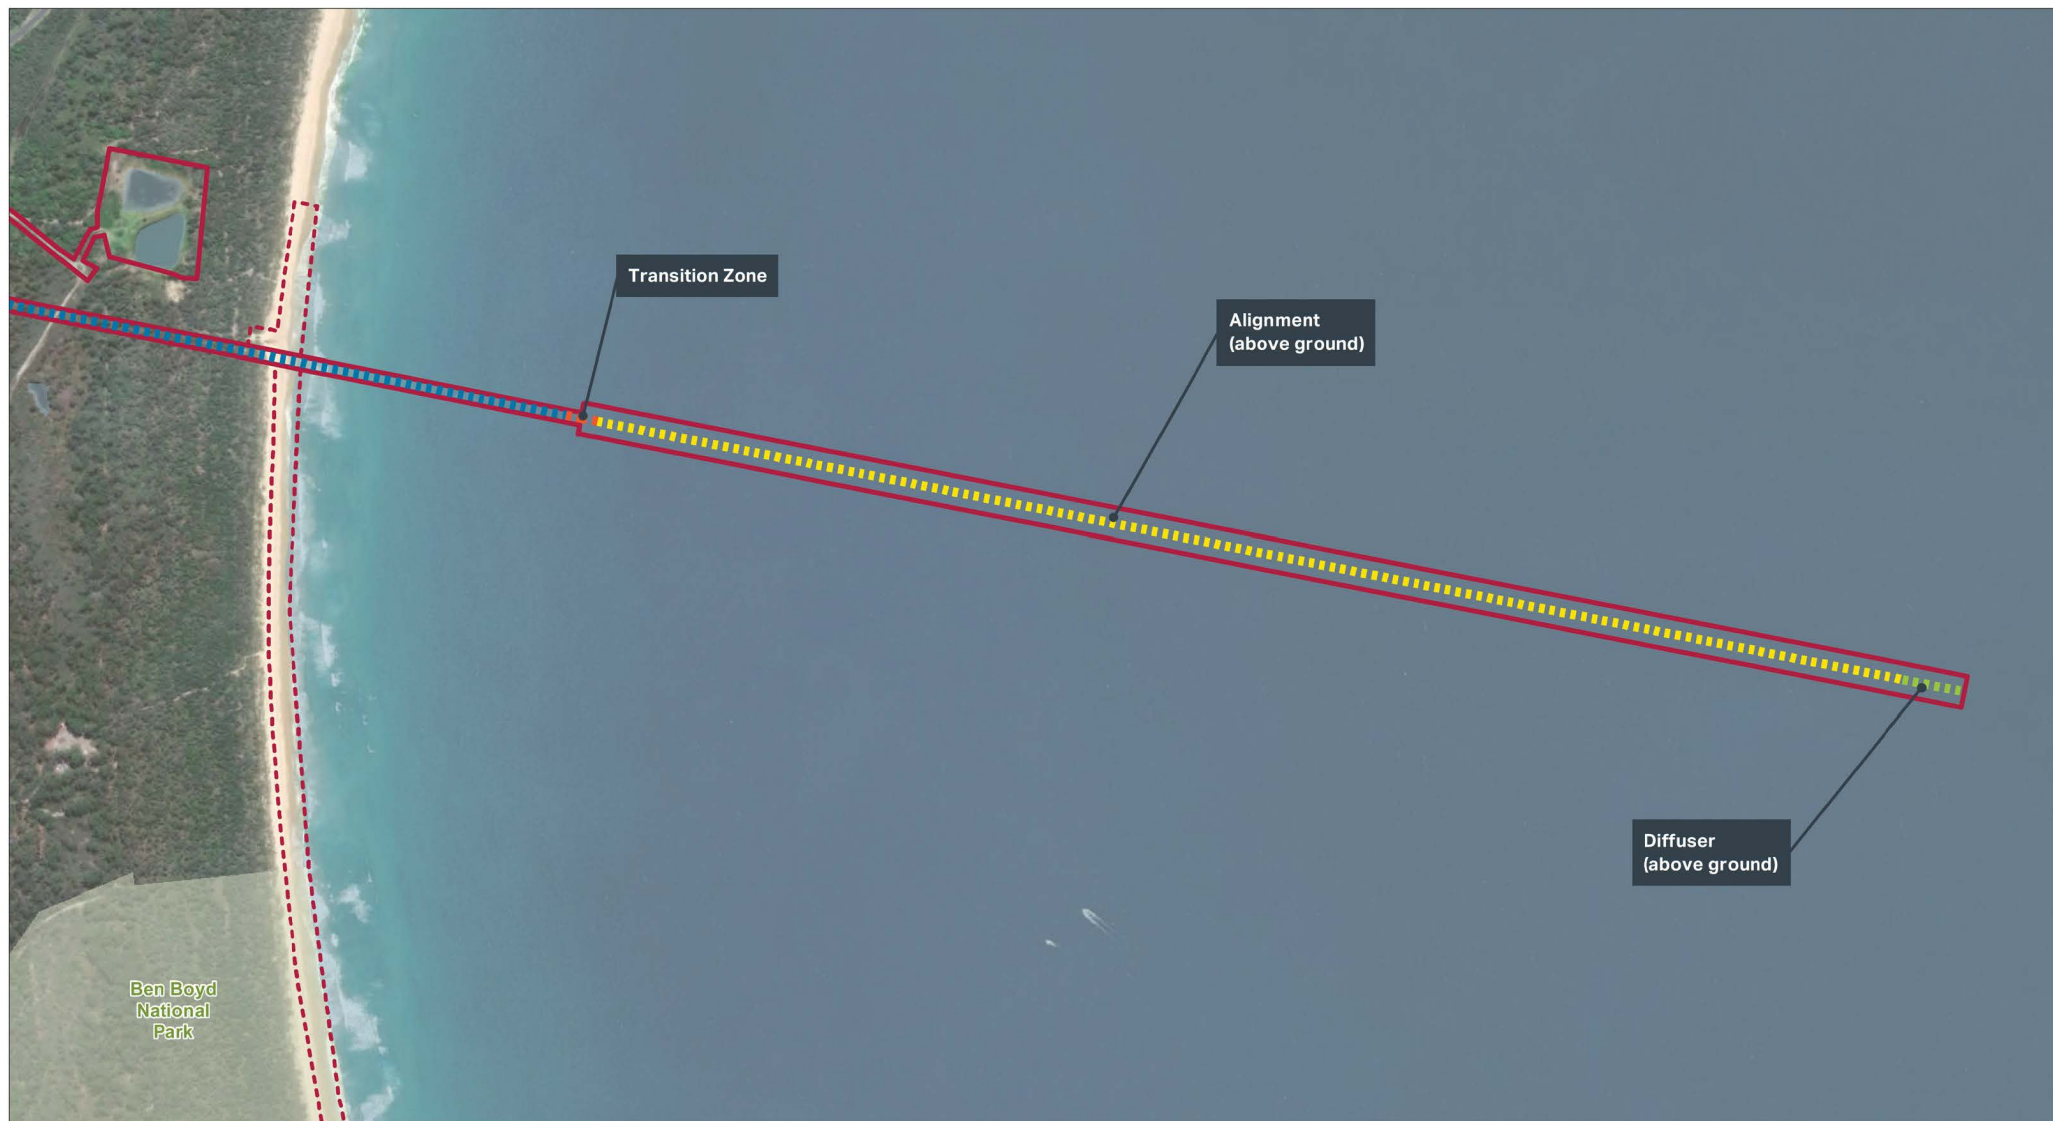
OCEAN OUTFALL PIPELINE – SECTION 2 (ABOVE SEAFLOOR)
